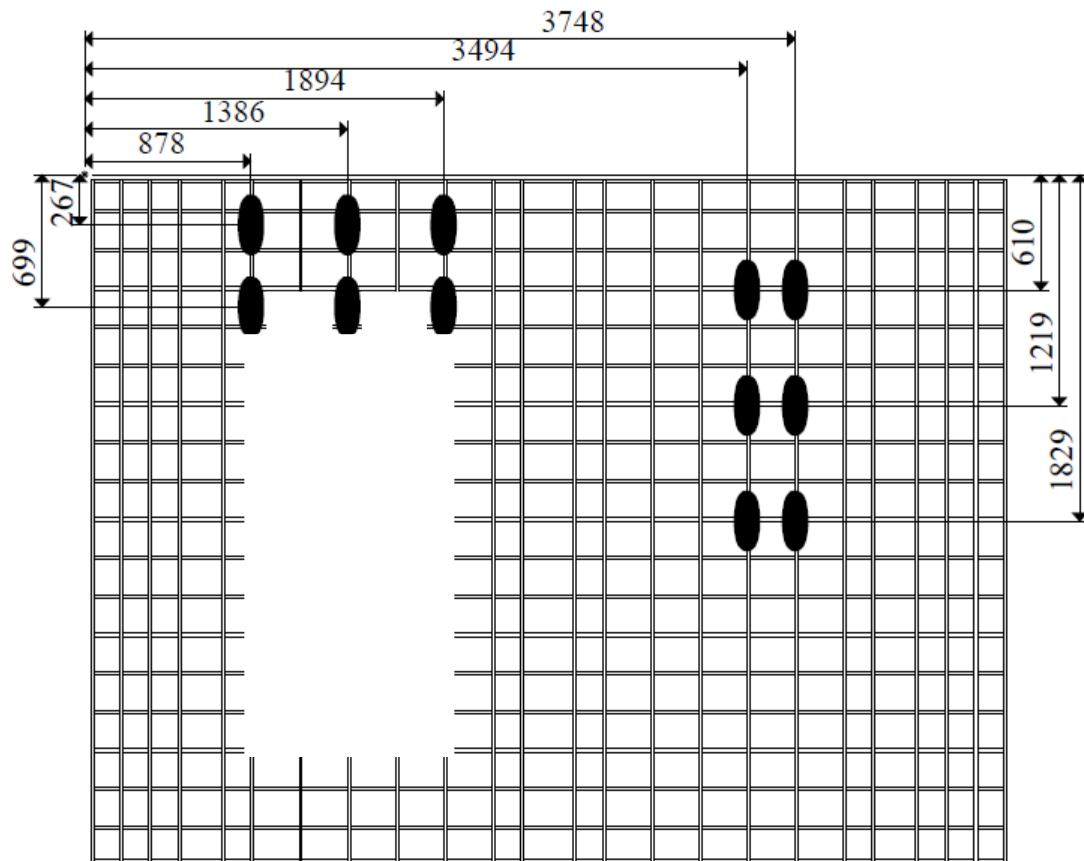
Layout of strain gages attached to bottom longitudinal steel reinforcement
